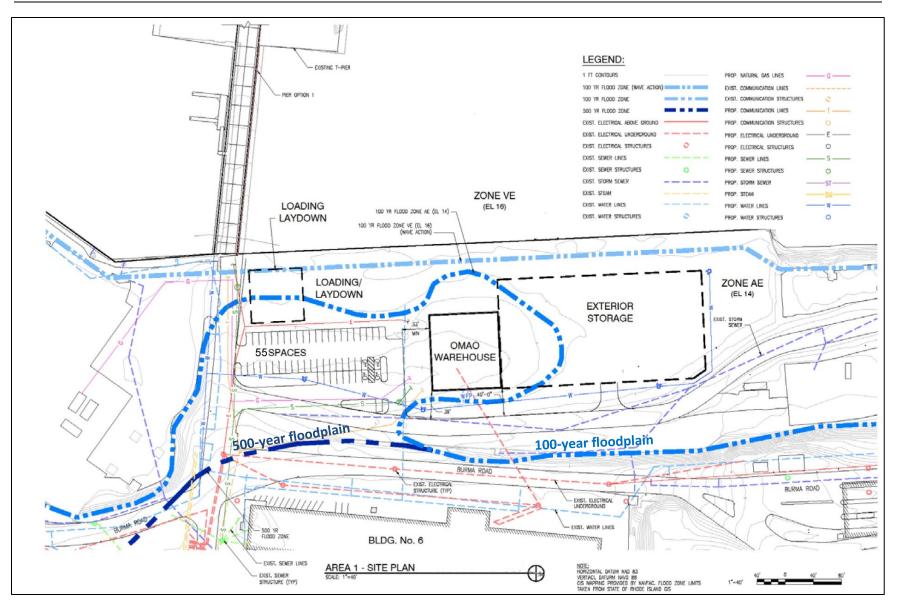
Shoreside Support Facilities at Pier Landing Site (Action Alternative)
